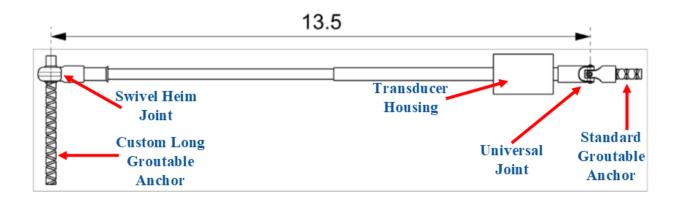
, Drawing, Detail of Crackmeter for Lower Centerline EDTs
